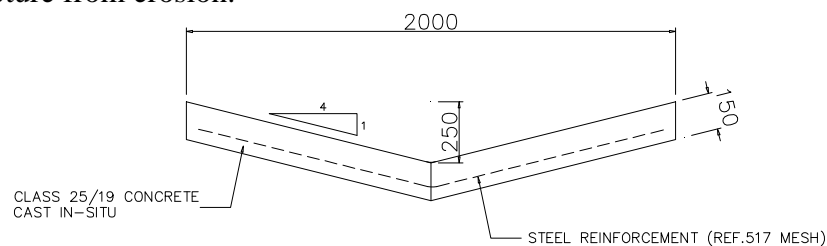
Proposed Concrete Lined Ditch for Cutting Sections
